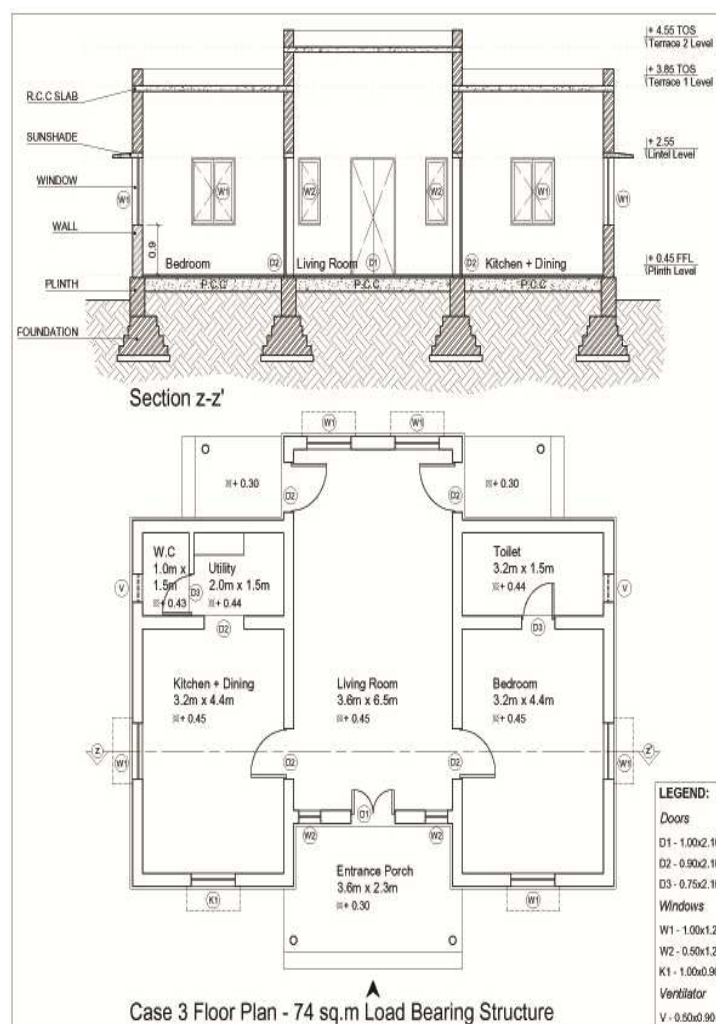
Residential Building Typology 3 – Load Bearing Structure
